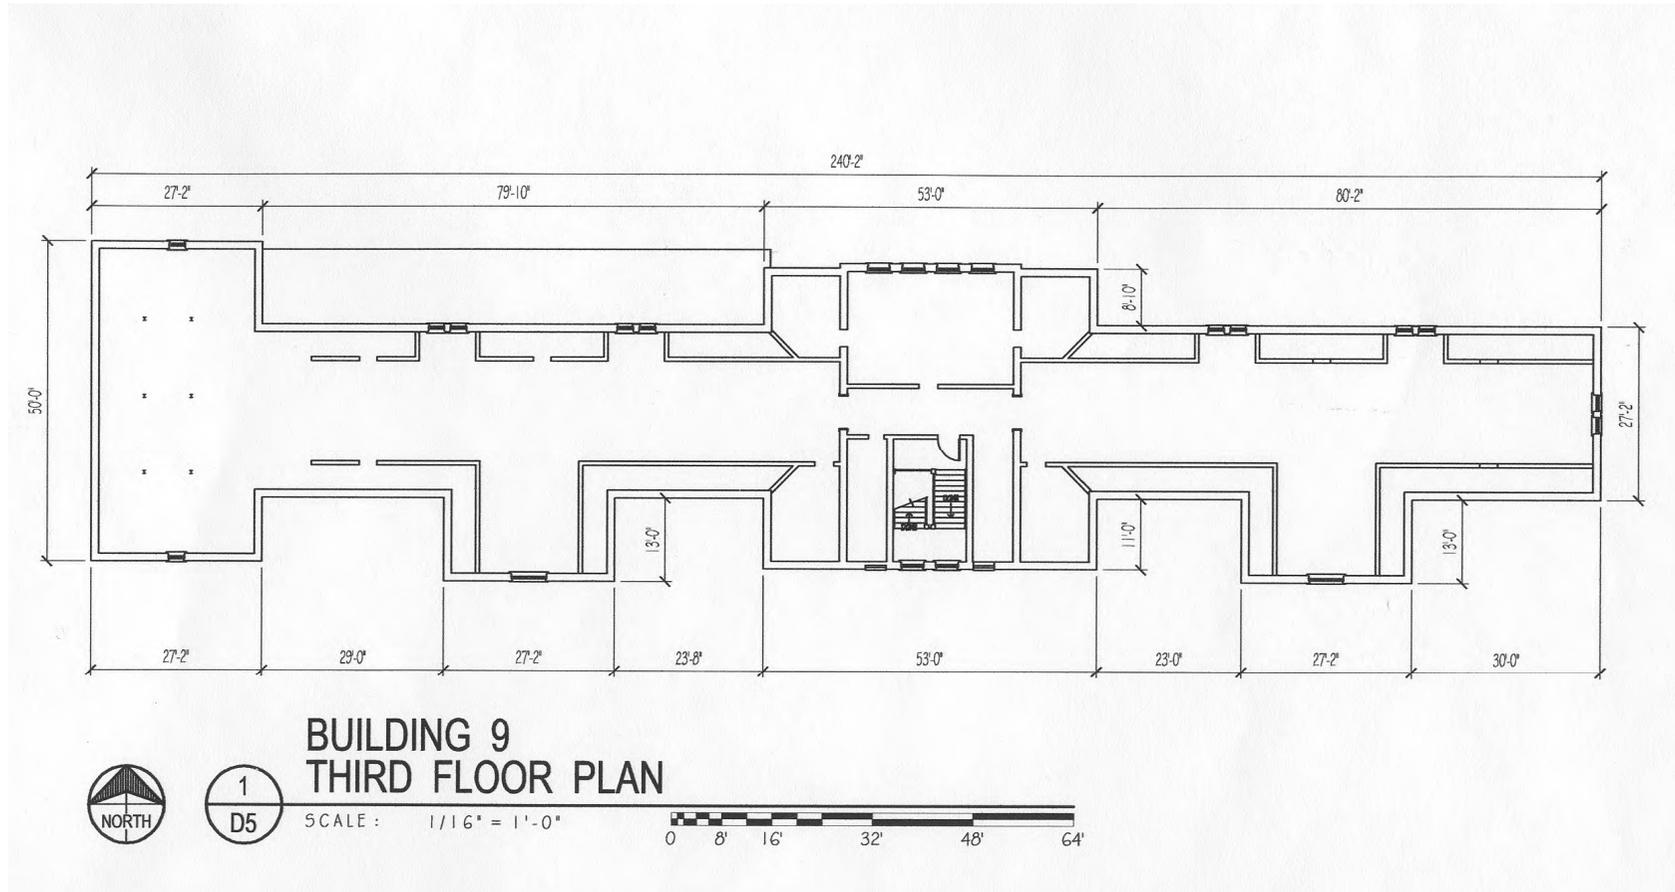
Third floor (or attic) plan of Building 9, showing existing conditions (Walton and Associates 2003).
